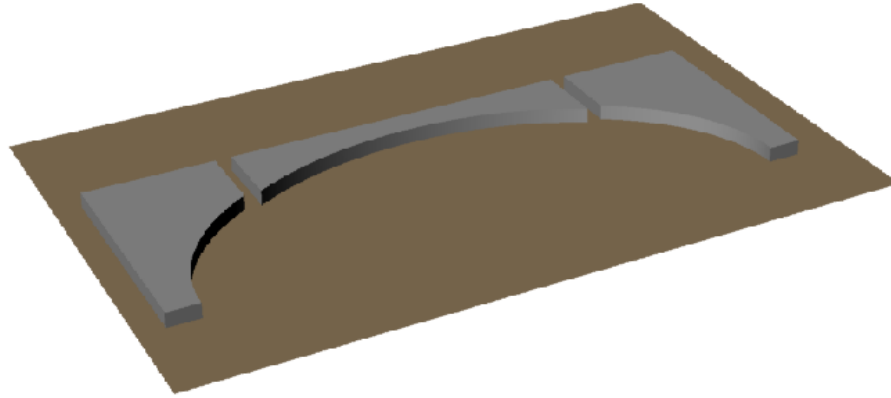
BEBO System Spandrel Wall Segments' Casting, Storage and Transportation Position
